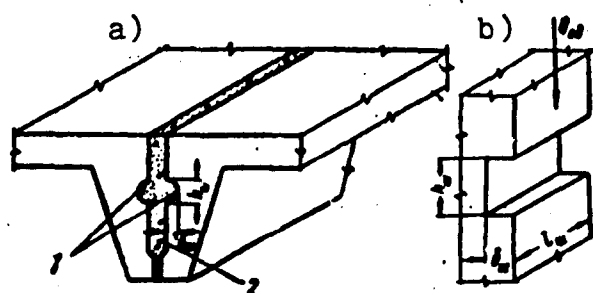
The joining of precast elements using concrete keys; a) the joining of two slabs with a concrete key; b) diagram of the distribution of shear and the rated dimensions of the concrete key; 1 - concrete keys; 2 - the filling of a joint with concrete or mortar.
